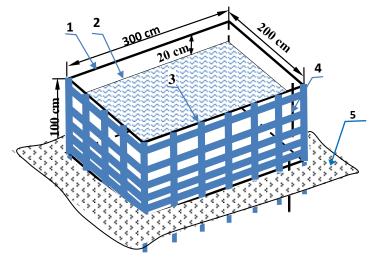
Schematic illustration of tarpaulin pond: 1. Tarpaulin wall, 2. Maximum water level, 3. Retaining poles, 4. Reinforcing bars, 5. Ground surface
